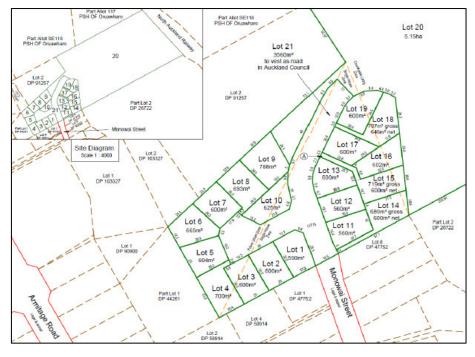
Lot 4 Monowai Street - Stage 1 Scheme Plan
